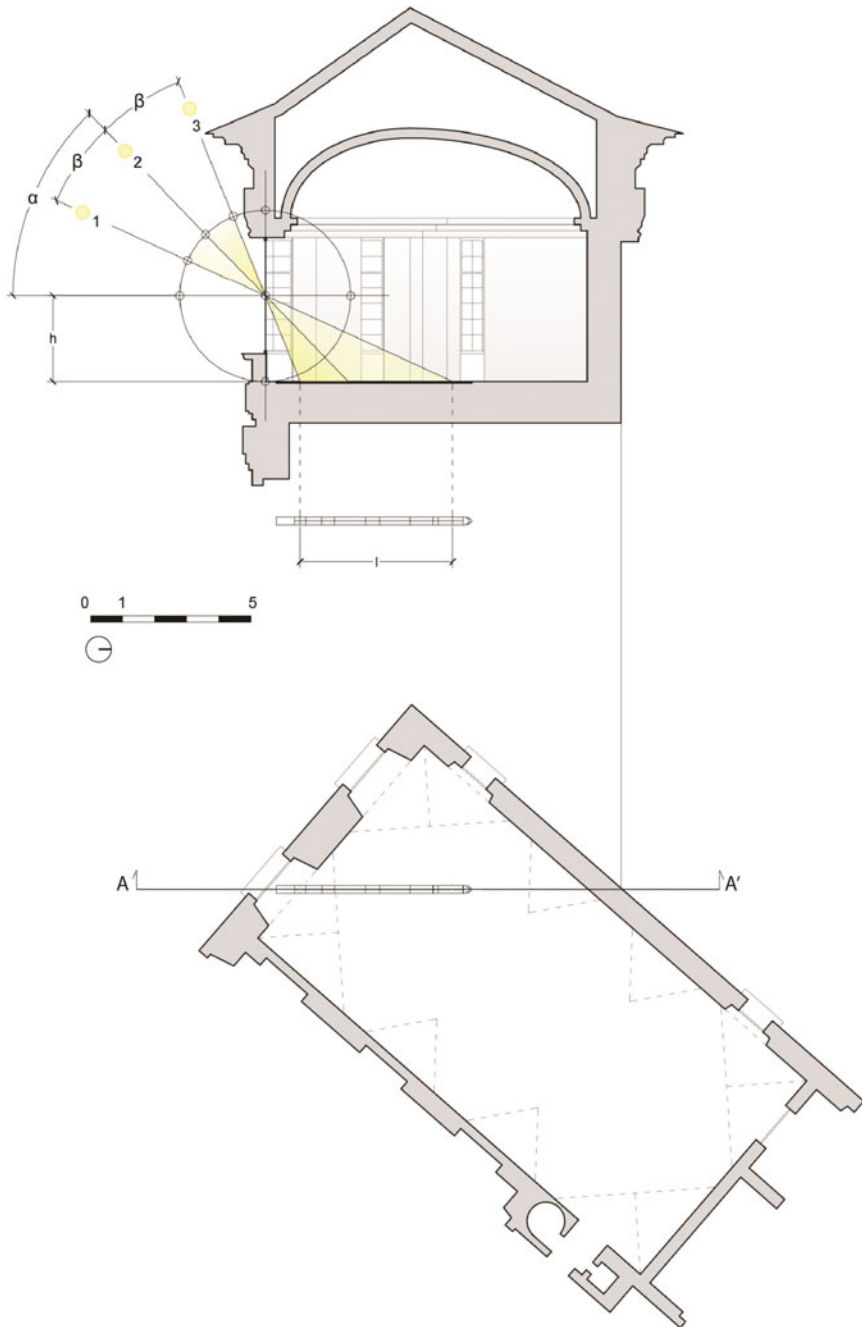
Sundial room: plan and section (Drawing: C. Cándito)
